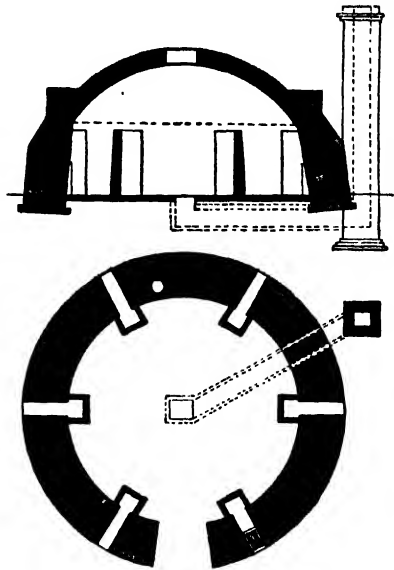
Cross Section of Round Down-Draught Kiln.
